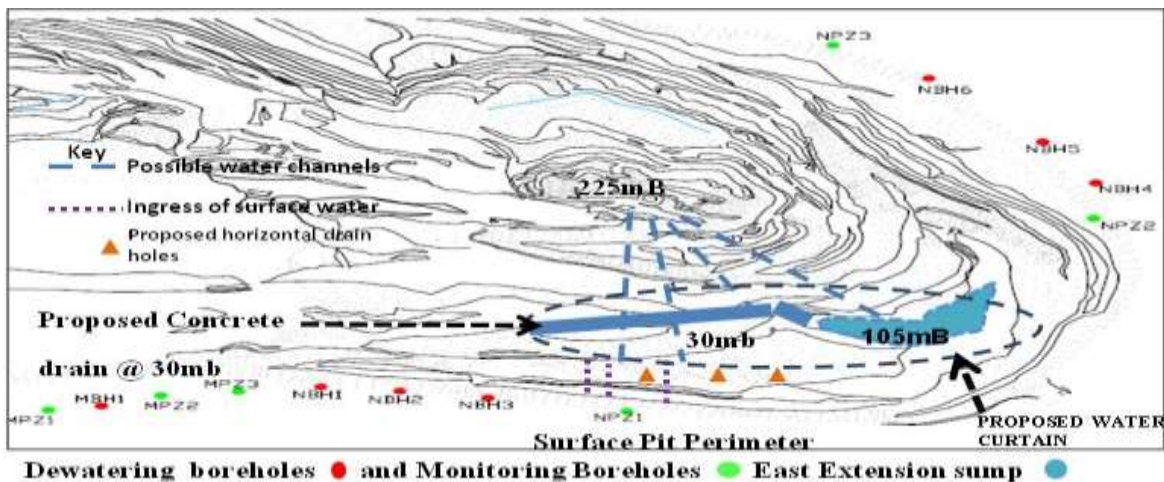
Pit layout and boreholes in the East of Nchanga Open Pit
